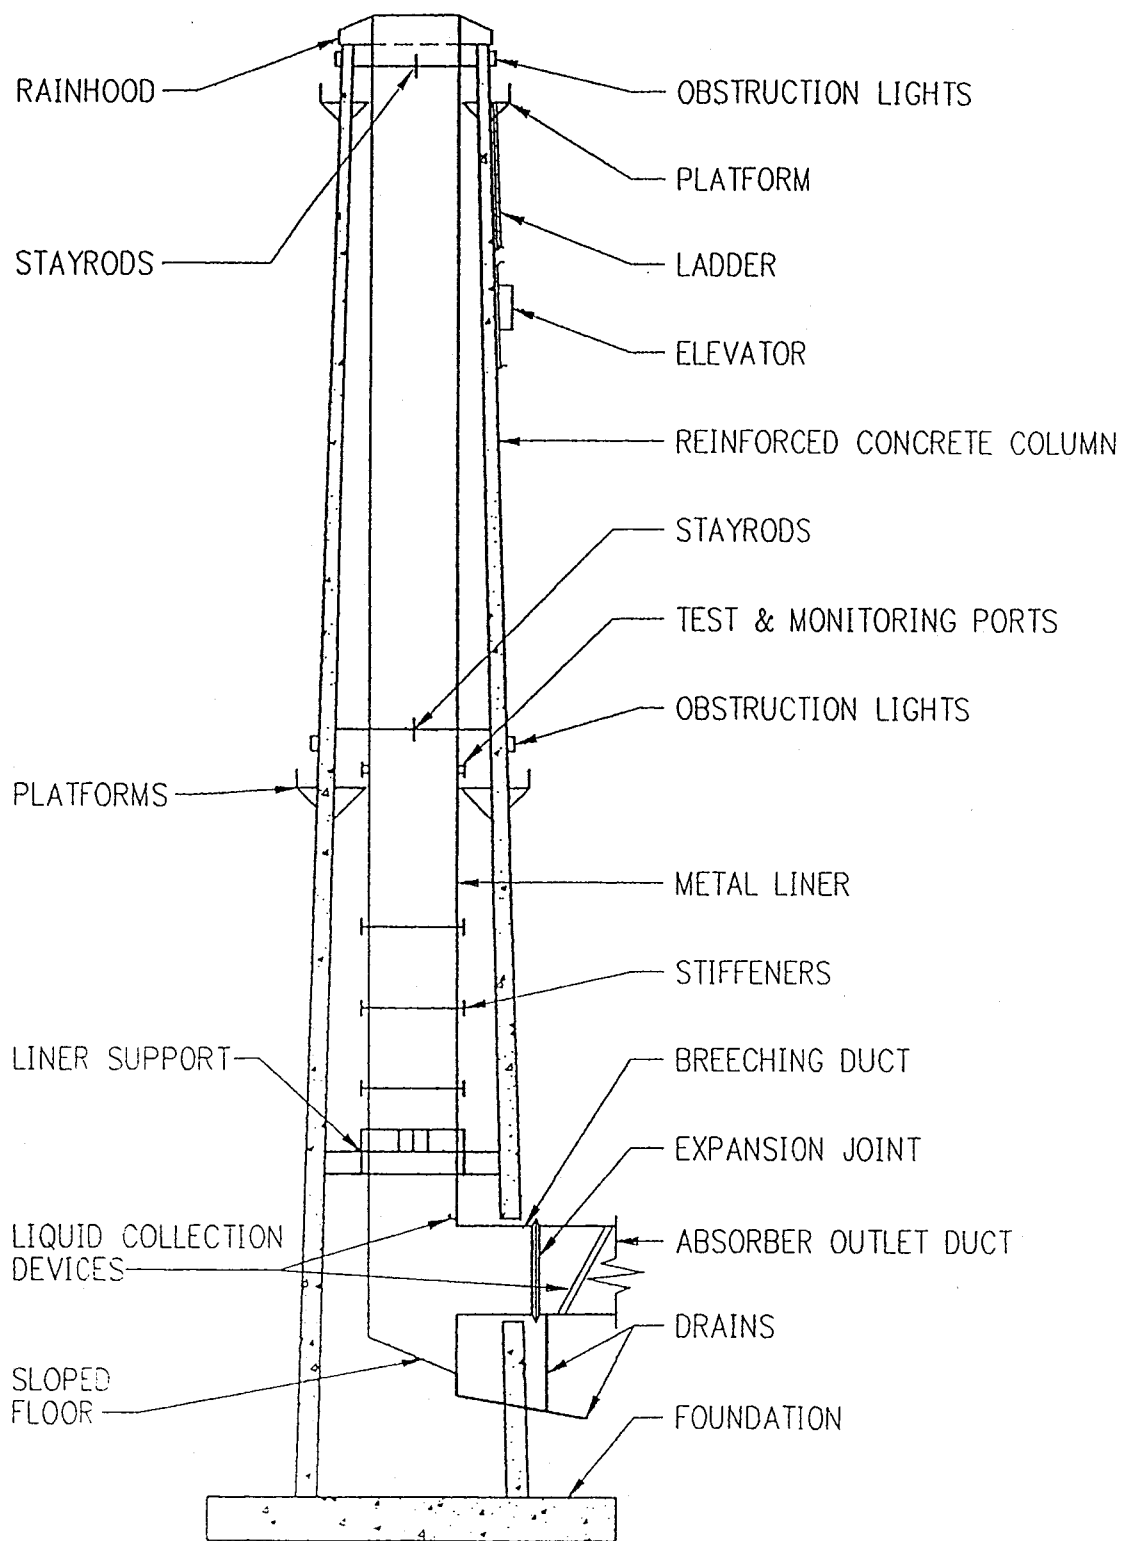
Chimney with Metal Liner Typical for Alloy, Glass Block or Protective Coating Liner System
